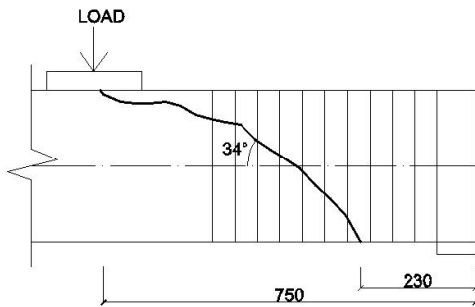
S1-2-450 prestressed concrete hollow-core slabs at failure. Note: 1 kN = 0.225 kip.
